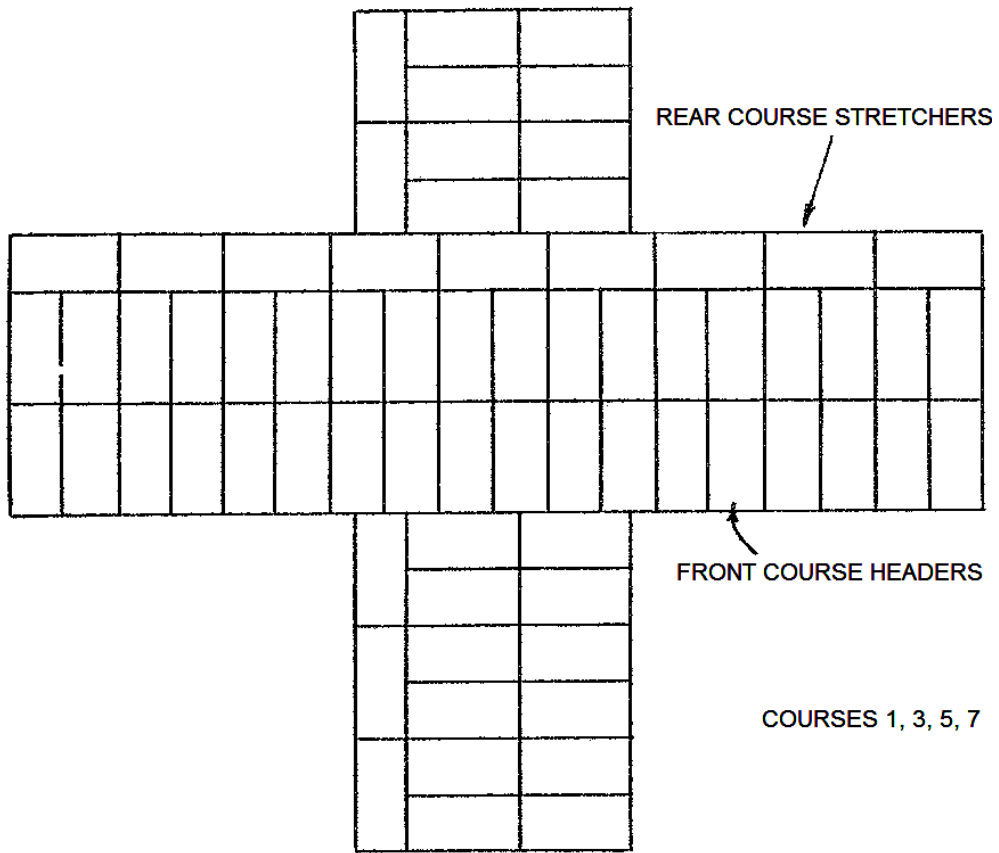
The alternate plan courses of a stopped intersection in English bond between two two-and-a-half brick walls.
